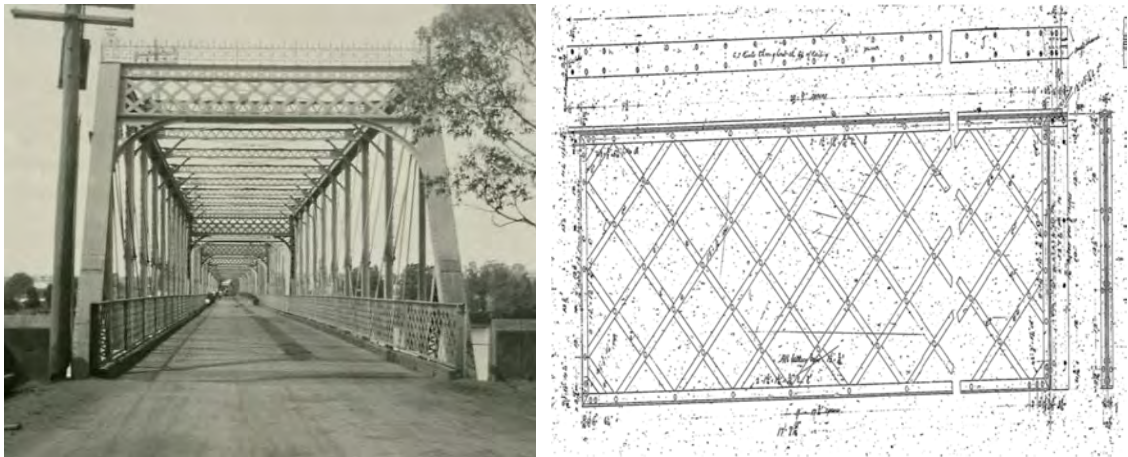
Original lattice bridge railing (Source: TfNSW)
